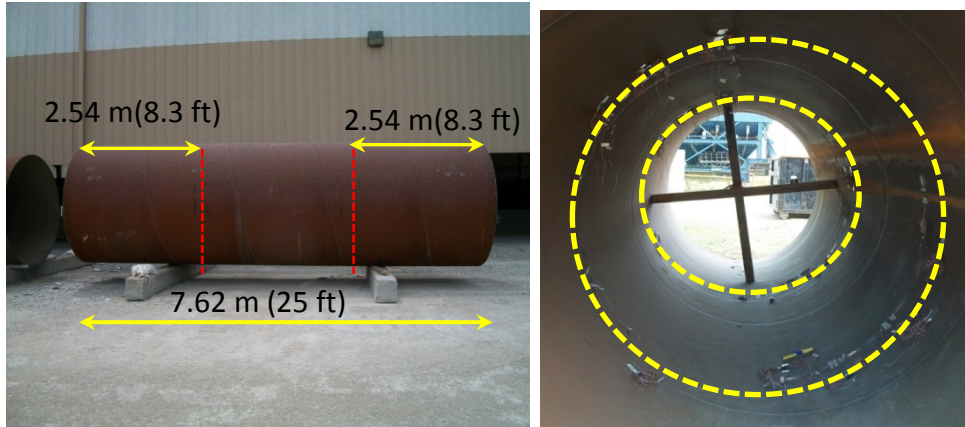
The instrumented 2.13-m (84-in.) steel pipes
